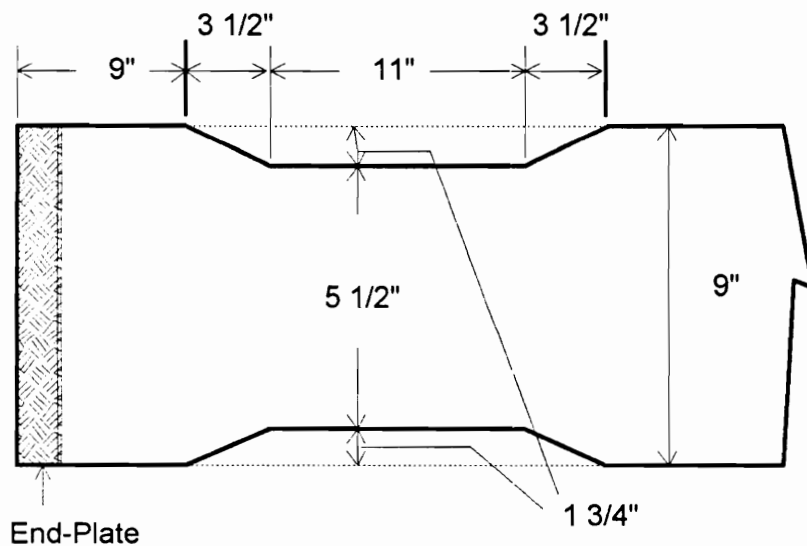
Weld Access Hole Elongation Cuts
